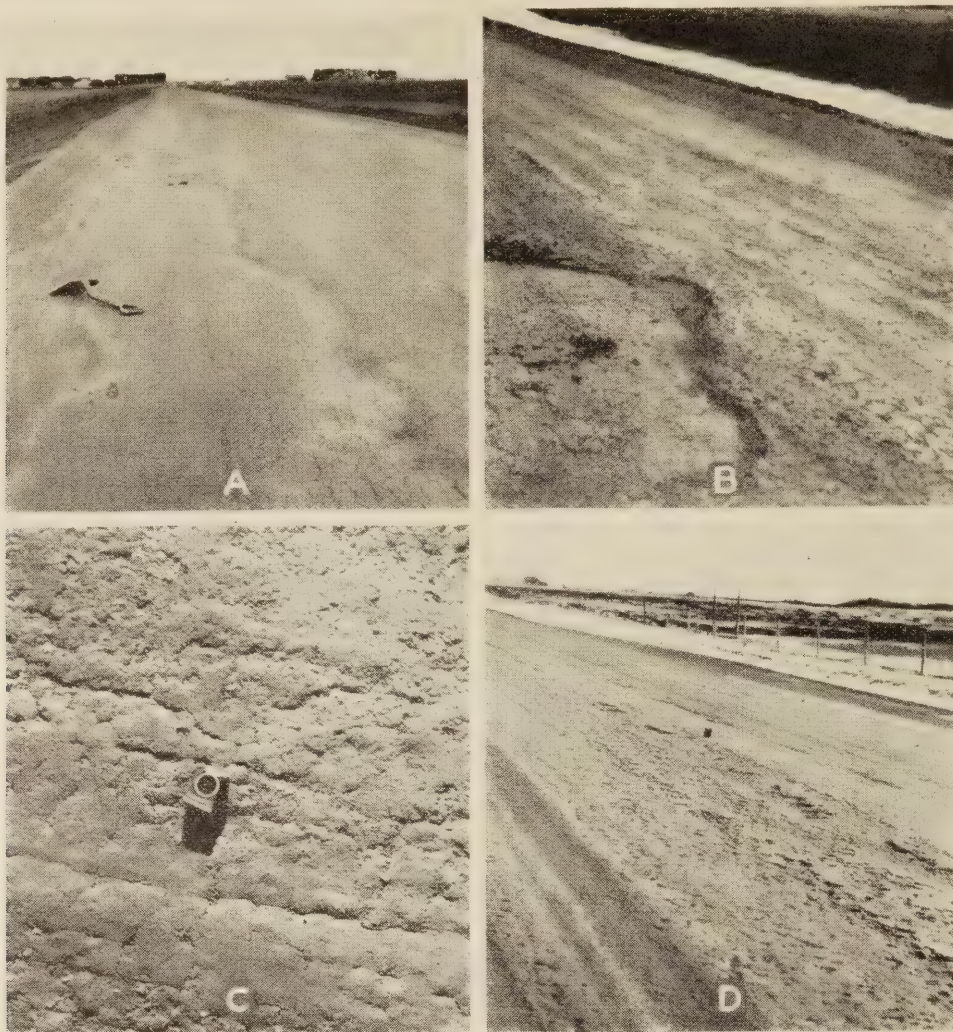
VIEWS OF THE ROAD SURFACE WITH: A, ENTIRE SURFACE DISPLACED AND MAT EXPOSED ON SECTION 10, B, SCALING CONDITION, C, SHRINKAGE CRACKS, AND D, PITTING.
